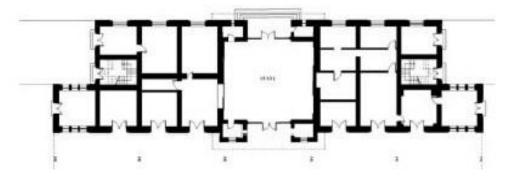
Diyarbakır station project / Ground floor plan²⁸
